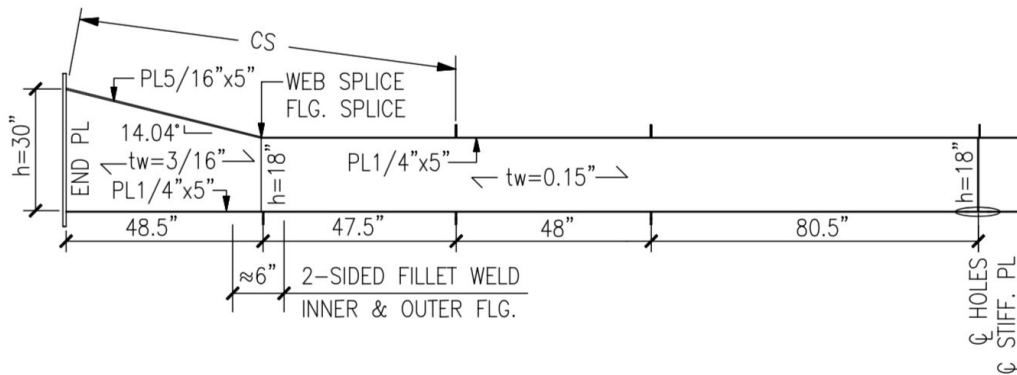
UCSD specimen PF2 details with a mostly untapered web and unbraced length (marked as CS) that contains the welded taper transition
